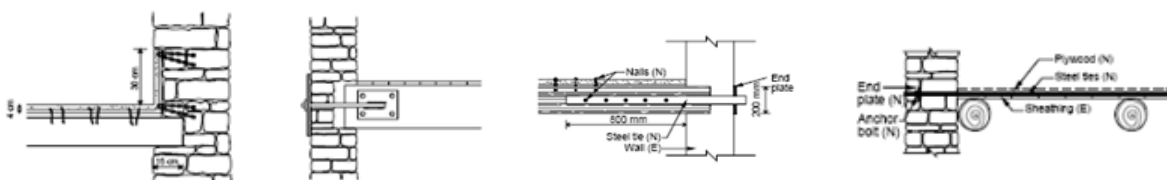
Alternative solutions to connect stiff diaphragm to masonry walls [8]
